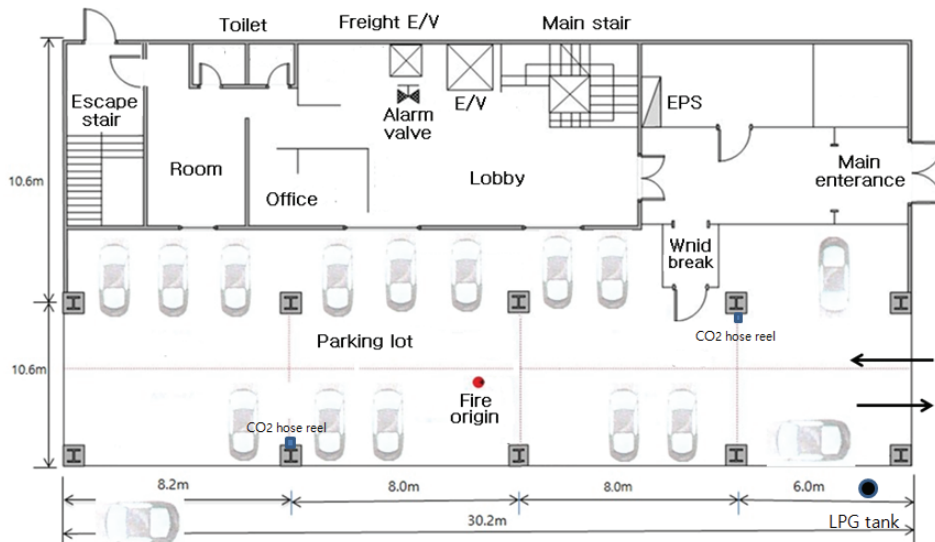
The 1st Floor Plan in Jechon Sports Center Fire (Lee, 2018a, c)
